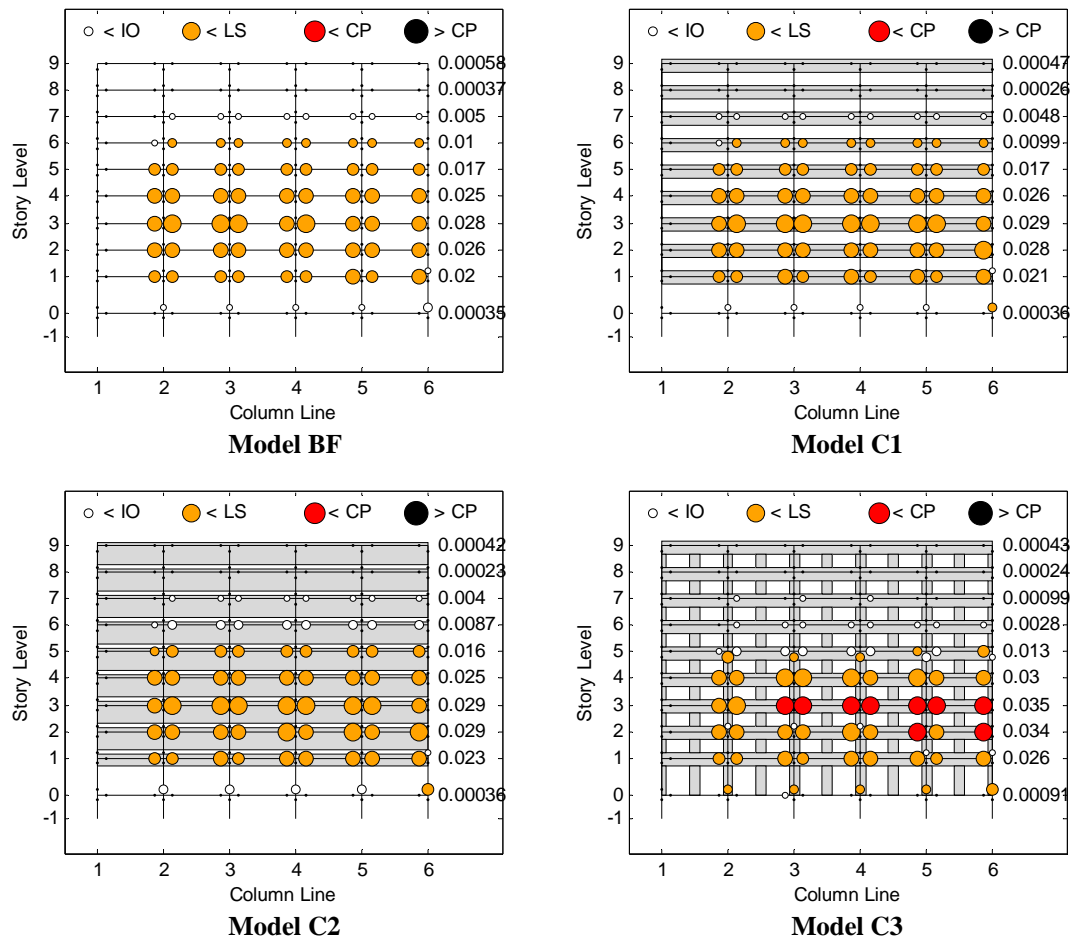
Beam/column plastic hinge demands at 2.5% roof drift
